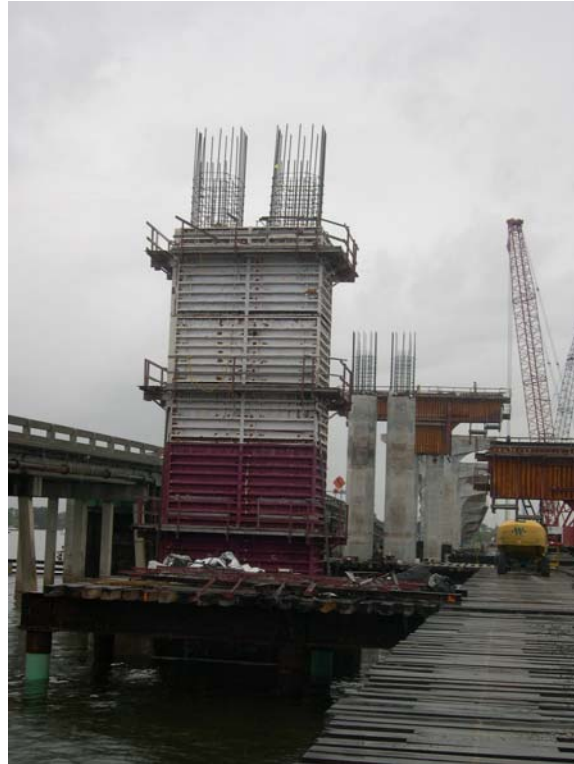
Photograph of pier number 11 column formwork and 2201 ss cage in place.
